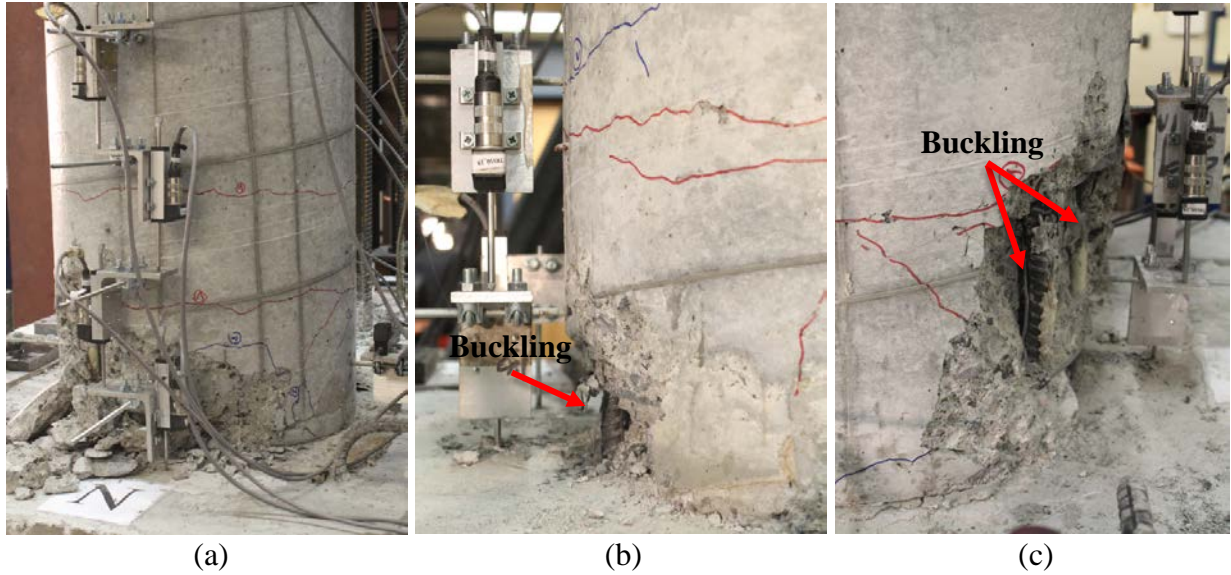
Damage in Column 2 for 1.68 x Curico X. (a) Spalling and crushing of concrete, (b) Bar buckling south side, (c) Bar buckling north side
